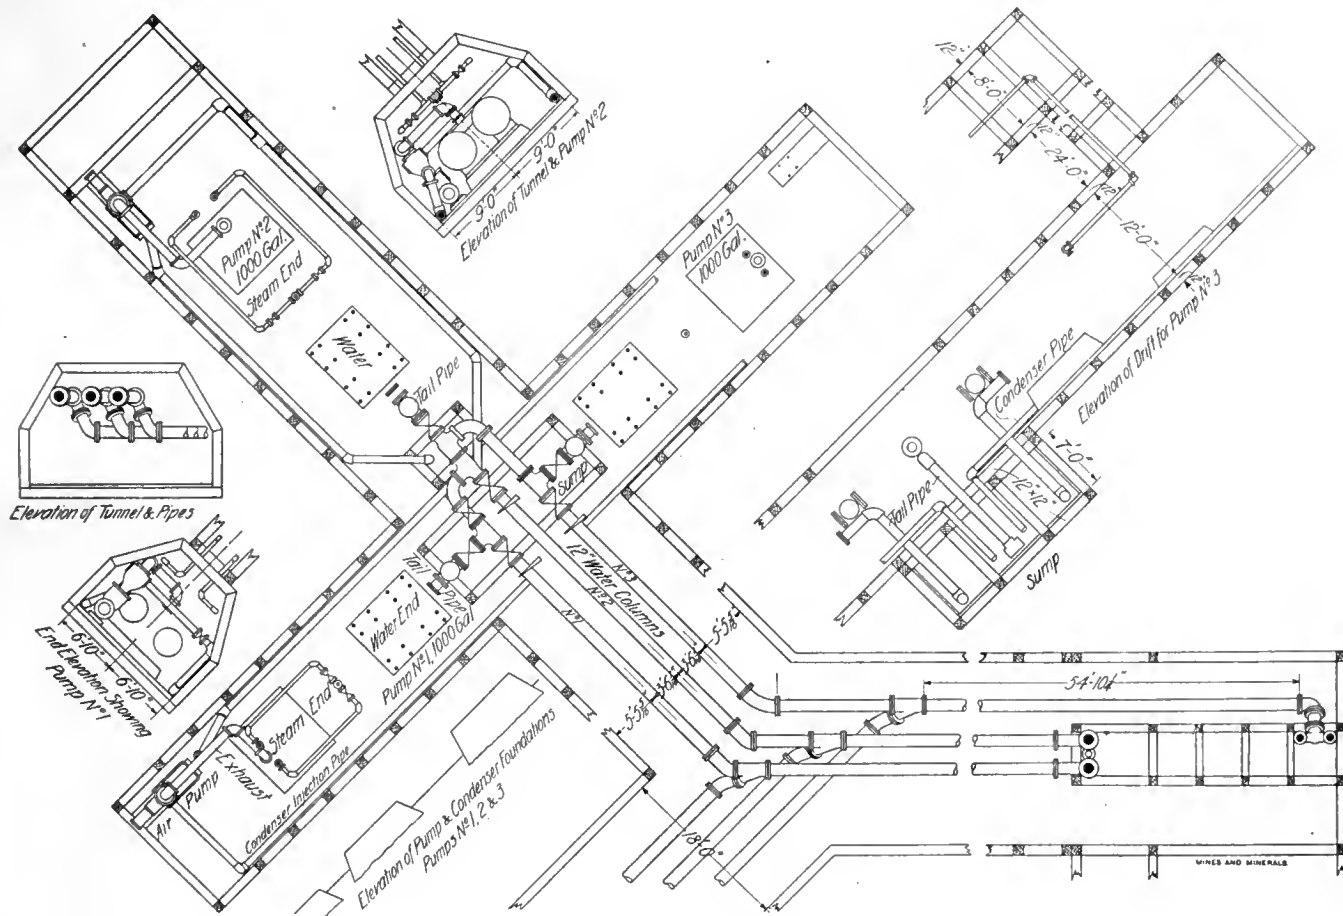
PLAN OF PIPING, JUNCTION SHAFT
